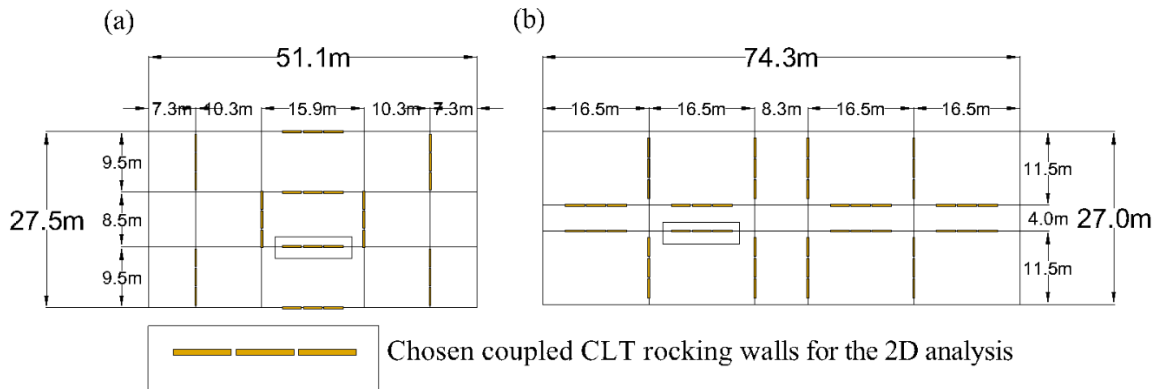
Prototype building plans showing CLT coupled rocking walls: (a) 5-story (b) 12-story building
